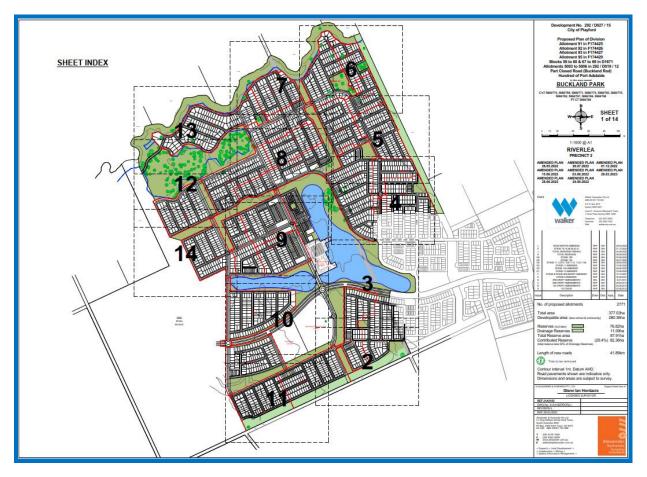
The Altered Precinct 2 Land Division Layout Plan
